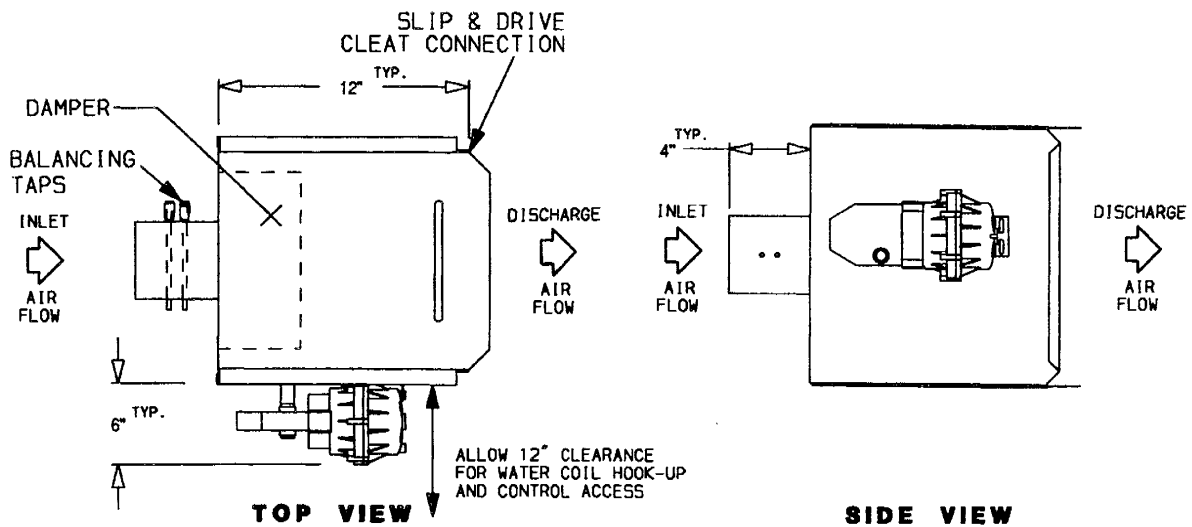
35DP (Pneumatic) Control Dimensions
